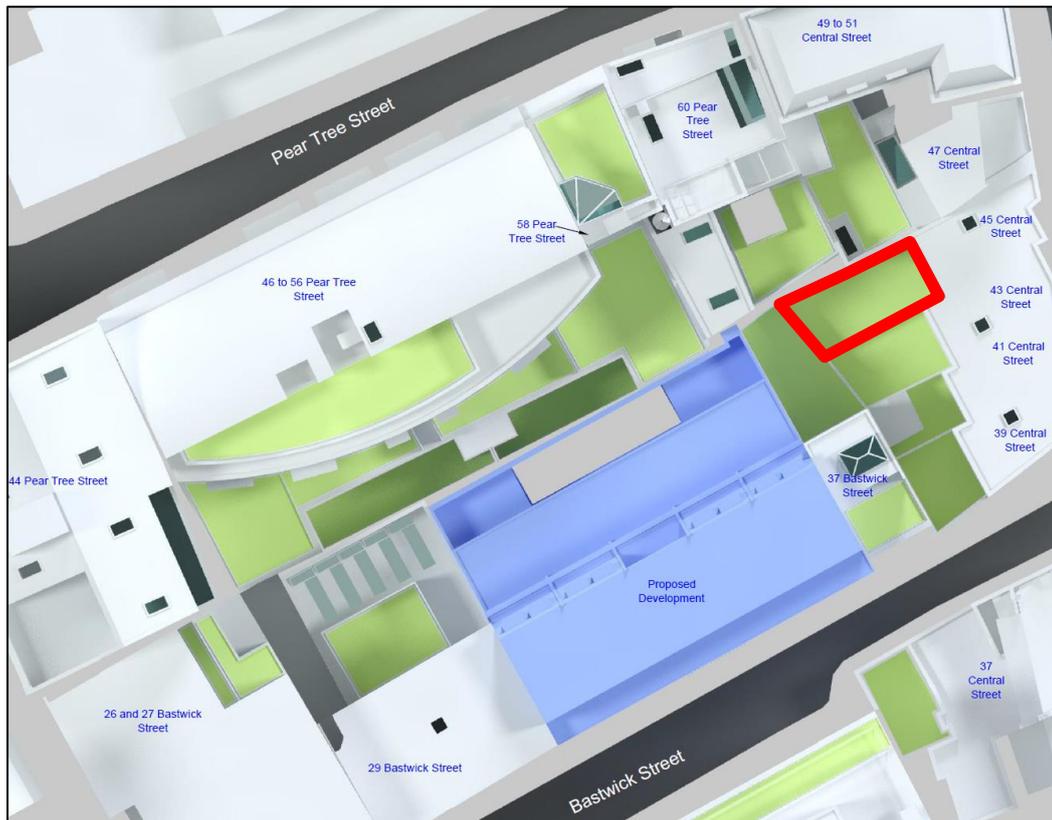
The location of Garden 11 to 45 Central Street shown outlined in red.
